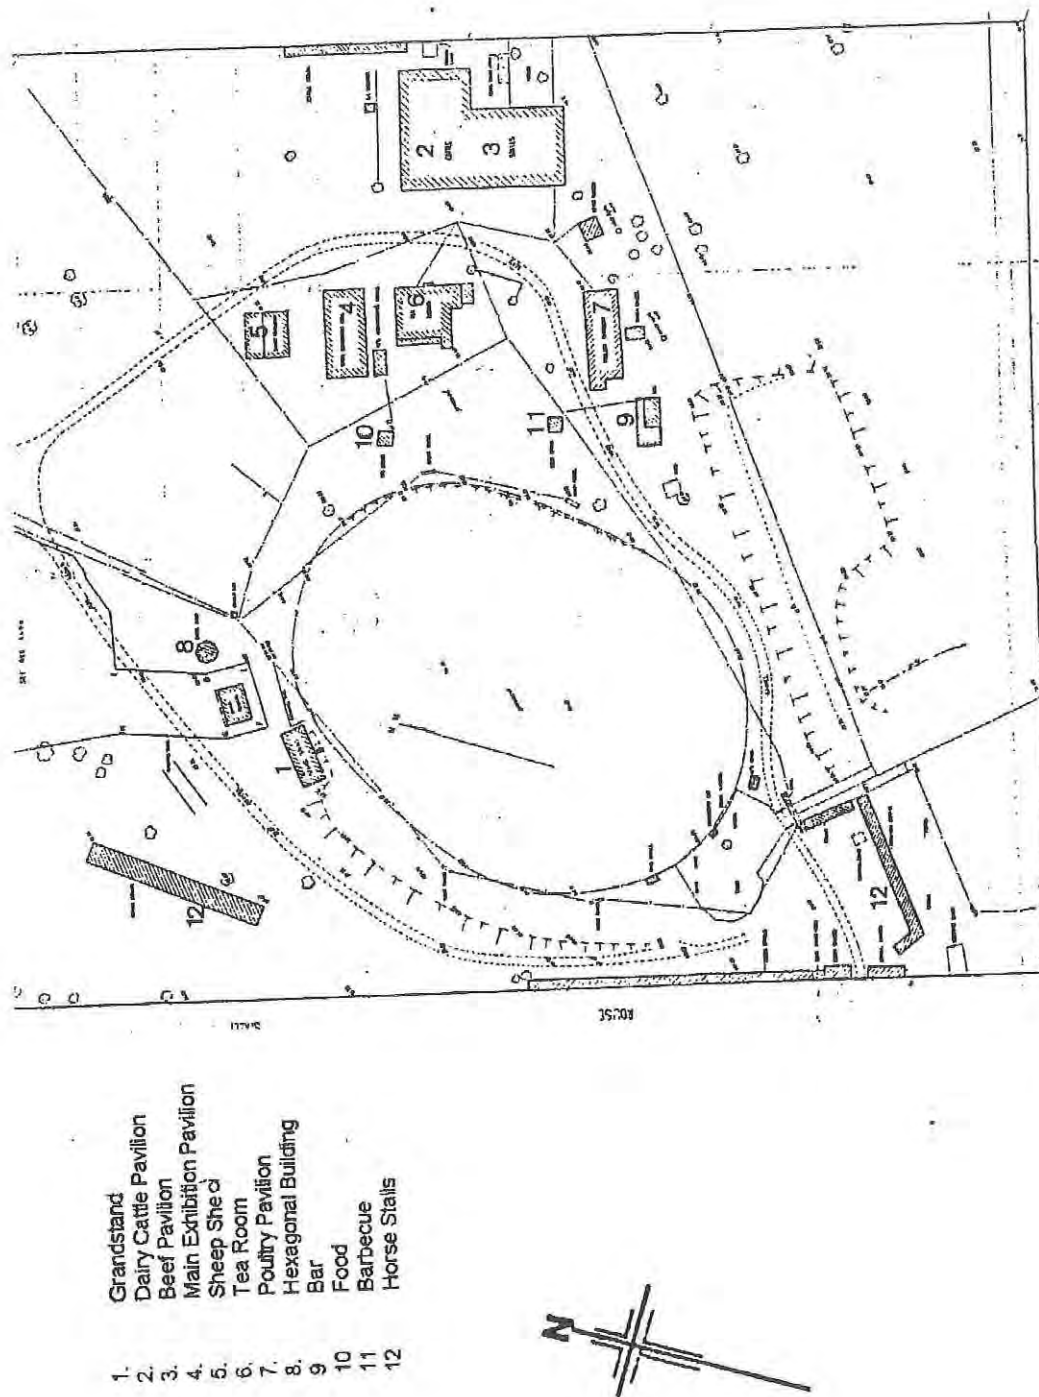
PLAN OF WINGHAM SHOWGROUND
